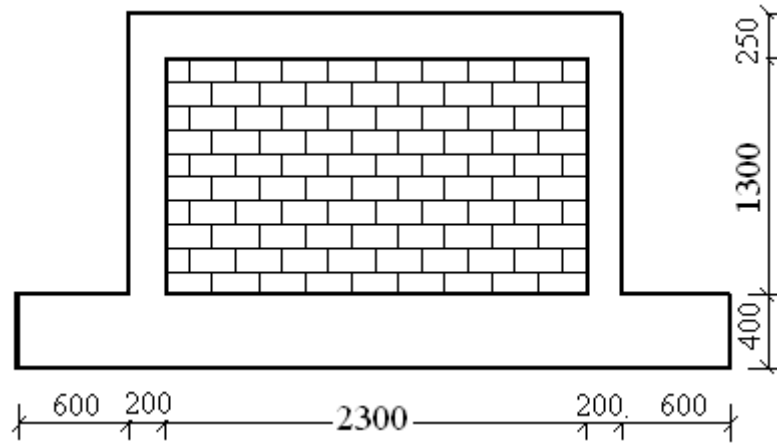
geometry of the infilled portal (width: r.c. elements=200 mm; wall=120 mm) [mm]
